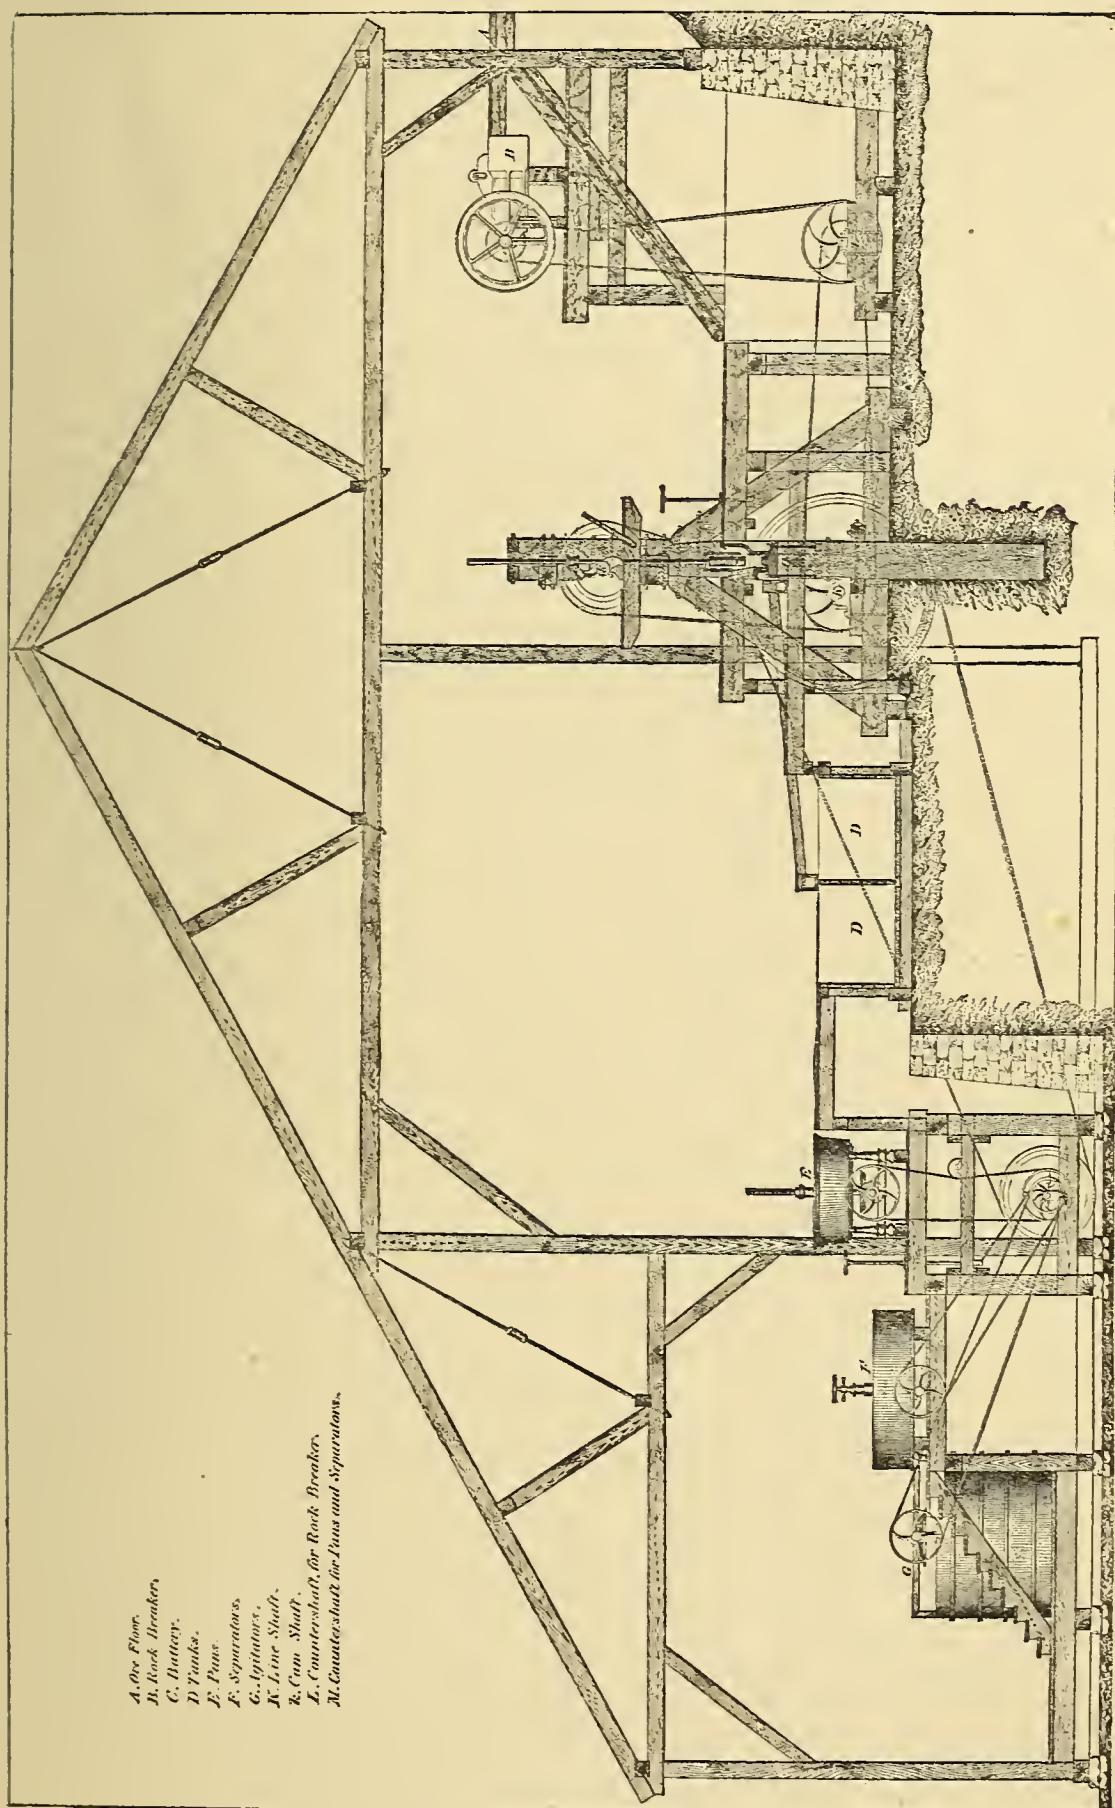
SECTION of SILVER MILL FOR WET CRUSHING. Scale $\frac{1}{200}$.
